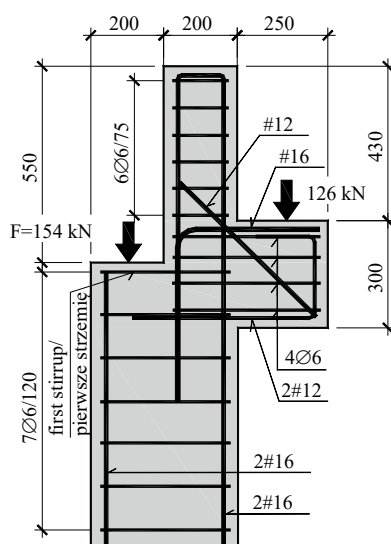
The head zone of a reinforced concrete column, with vertical forces based on [1]
